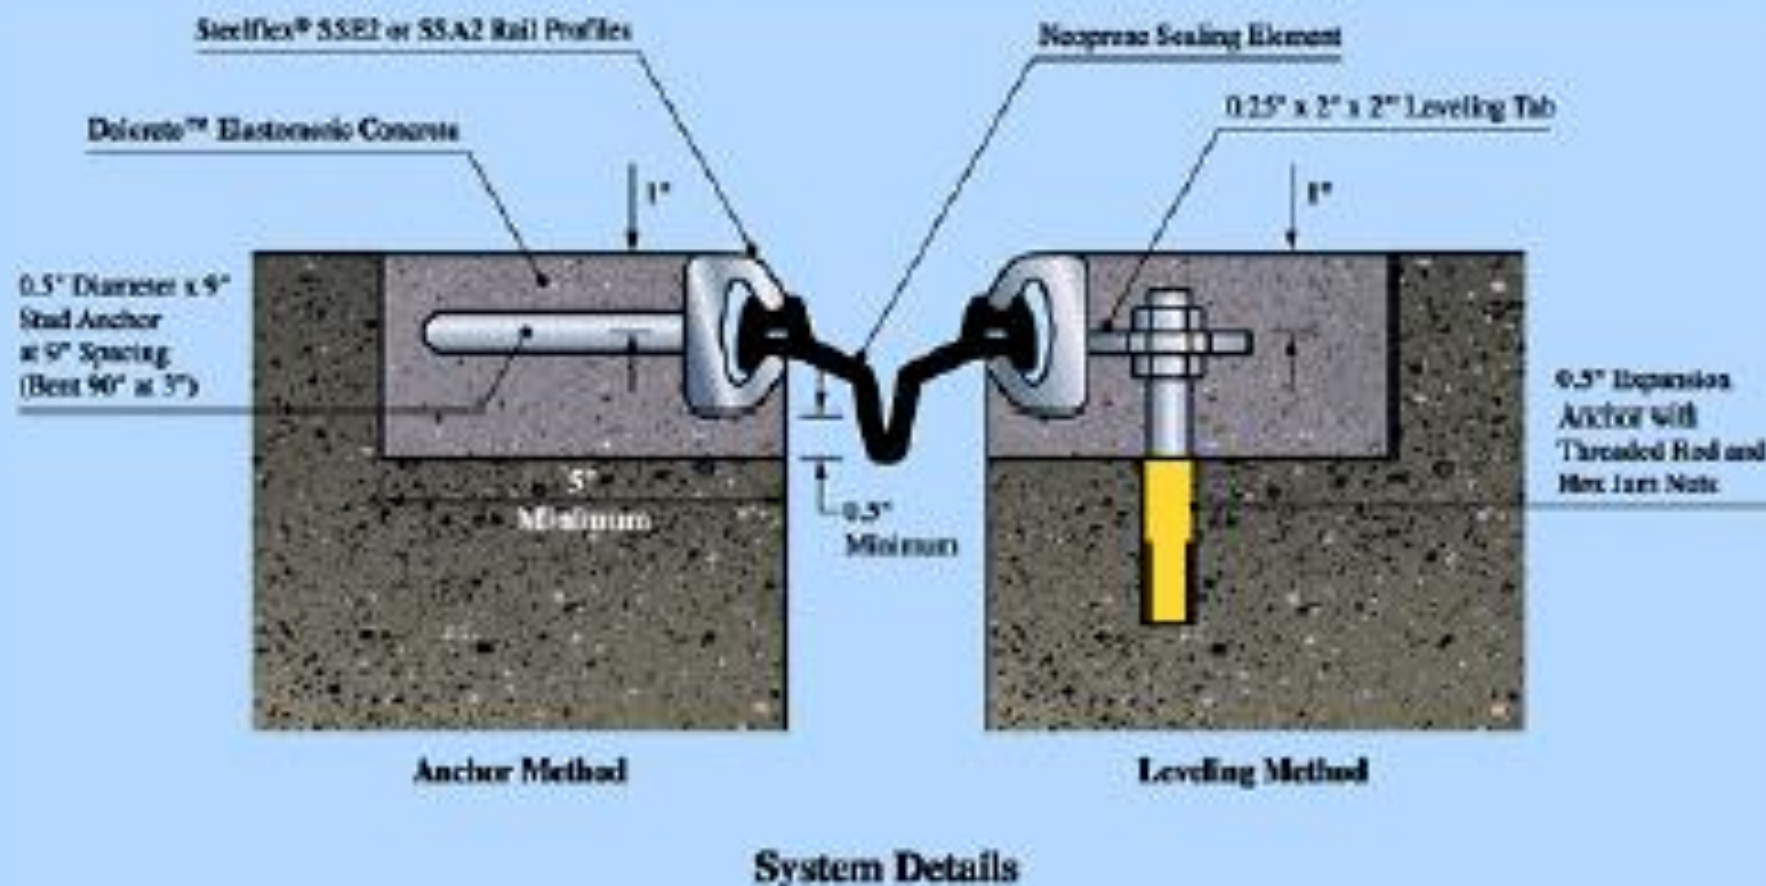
Strip Seal (Drawing Courtesy of the D.S. Brown Co.)
